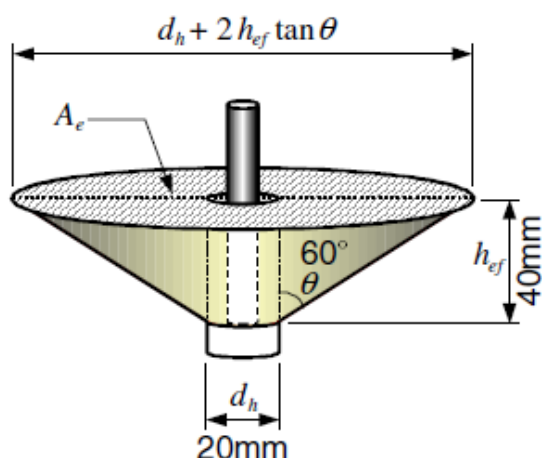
Pullout (concrete cone) failure of concrete [Ref.: 029]
